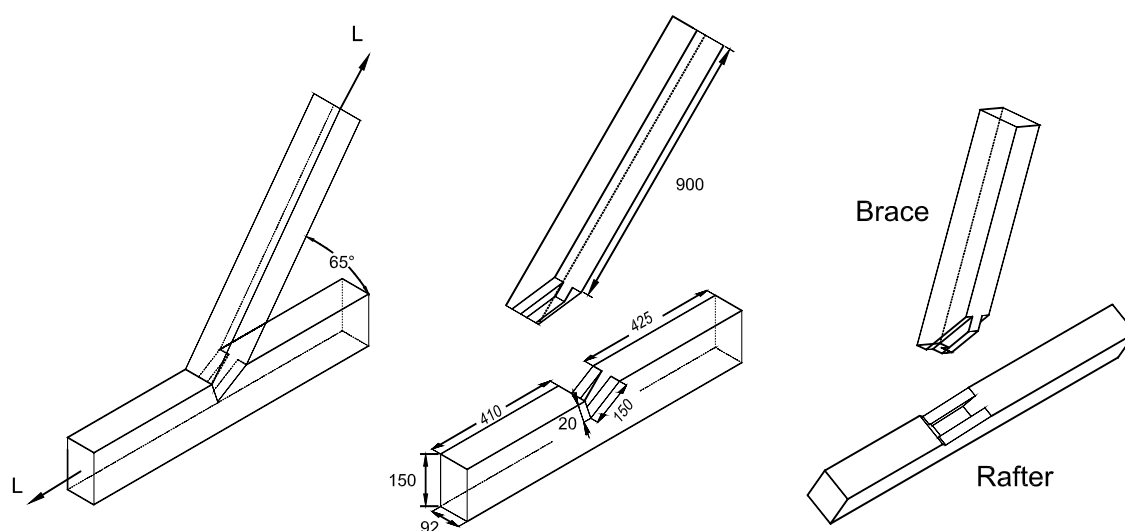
Geometry of the test specimens (dimensions in mm).
